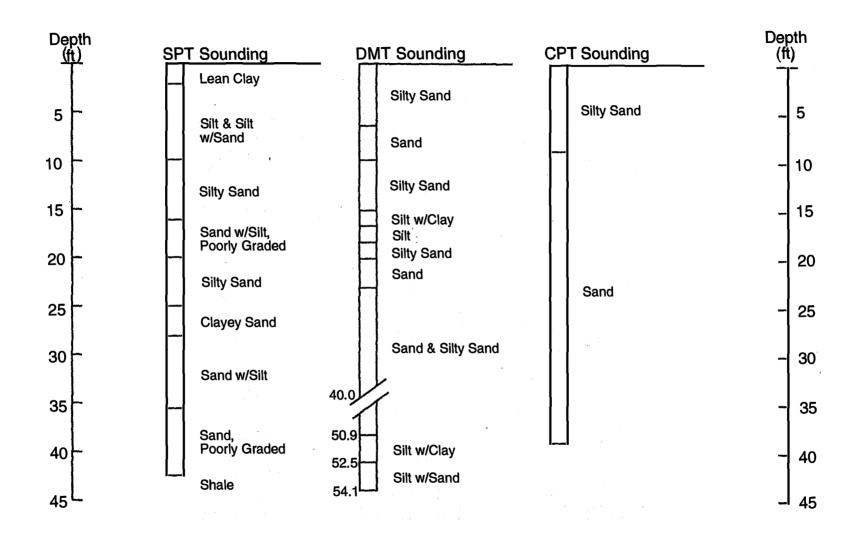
Soil Profile Based on In Situ Testing at Abutment C1
